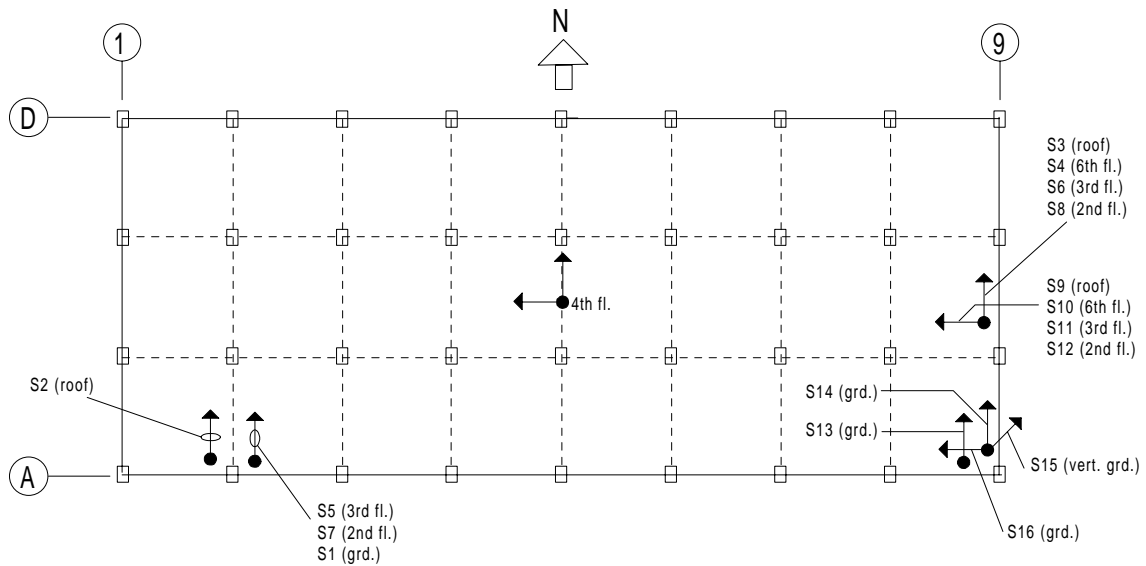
Typical Floor Framing Plan and Location of Strong Motion Sensors
